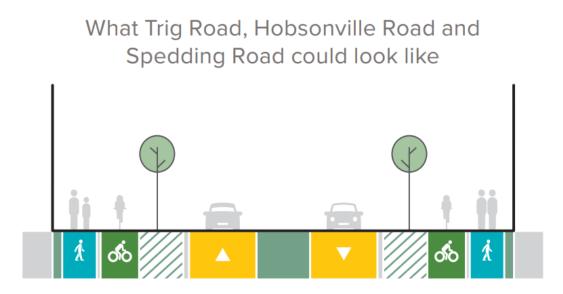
Potential Spedding Road Layout (Source: Supporting Growth Programme)
